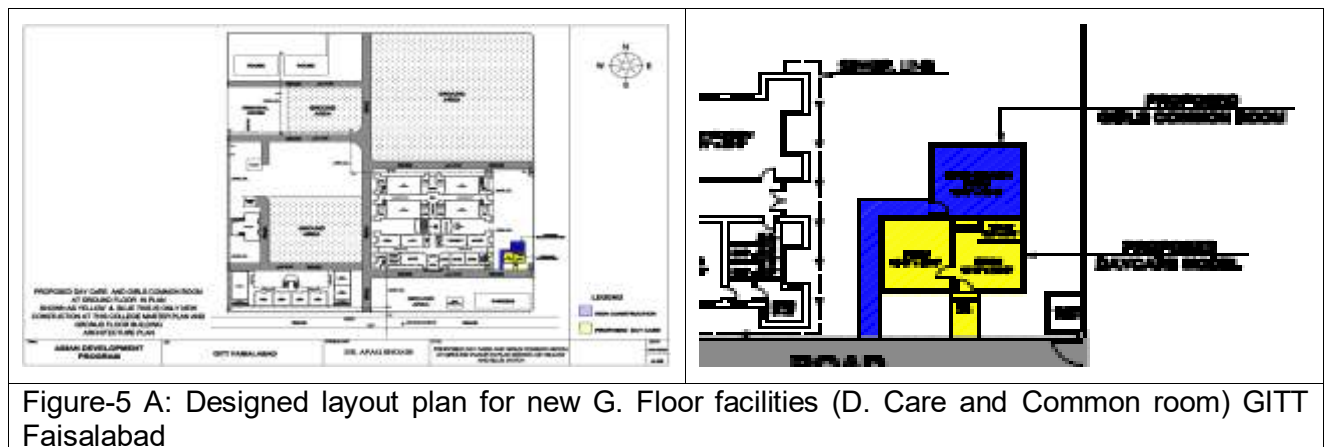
A: Designed layout plan for new G. Floor facilities (D. Care and Common room) GITT Faisalabad
